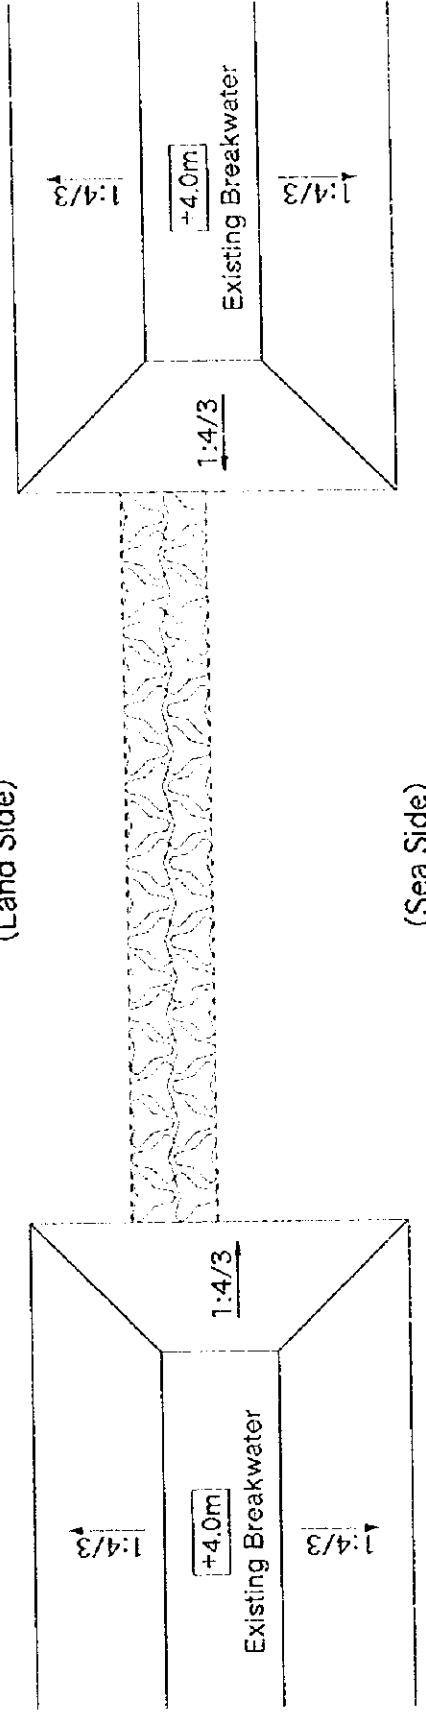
2 (5) Typical Section of Seawall, Type E
